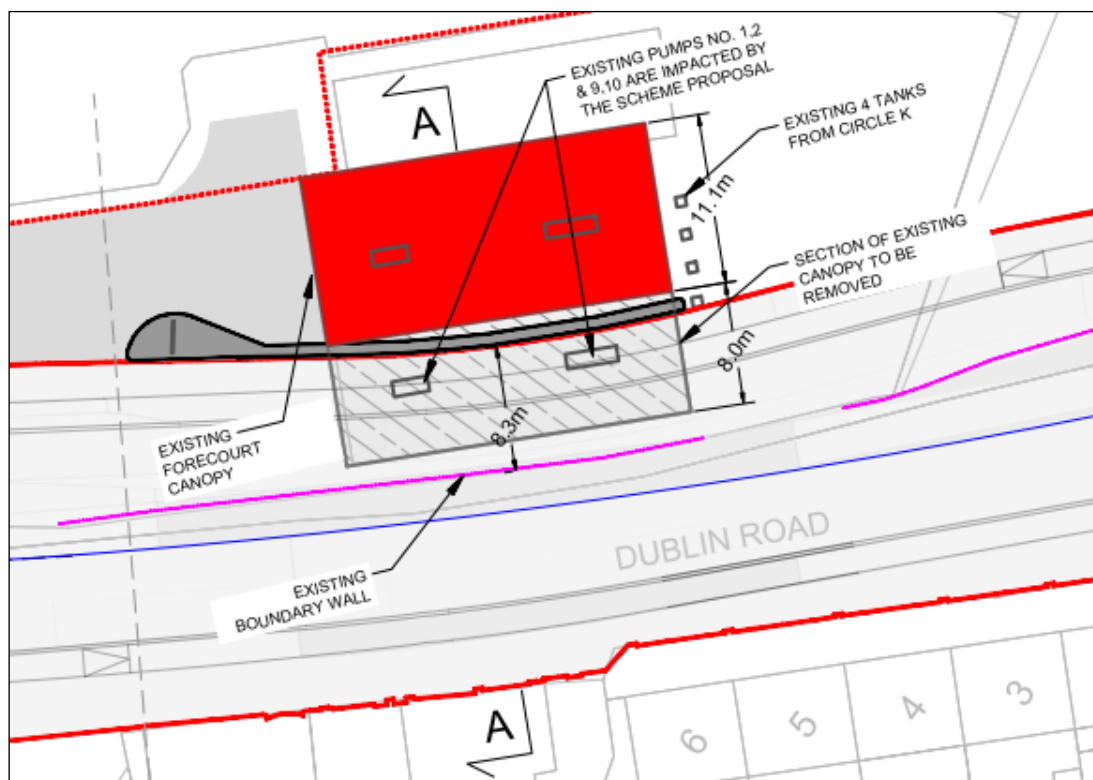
Extract from Circle K General Arrangement Drawing (Sheet 01)
